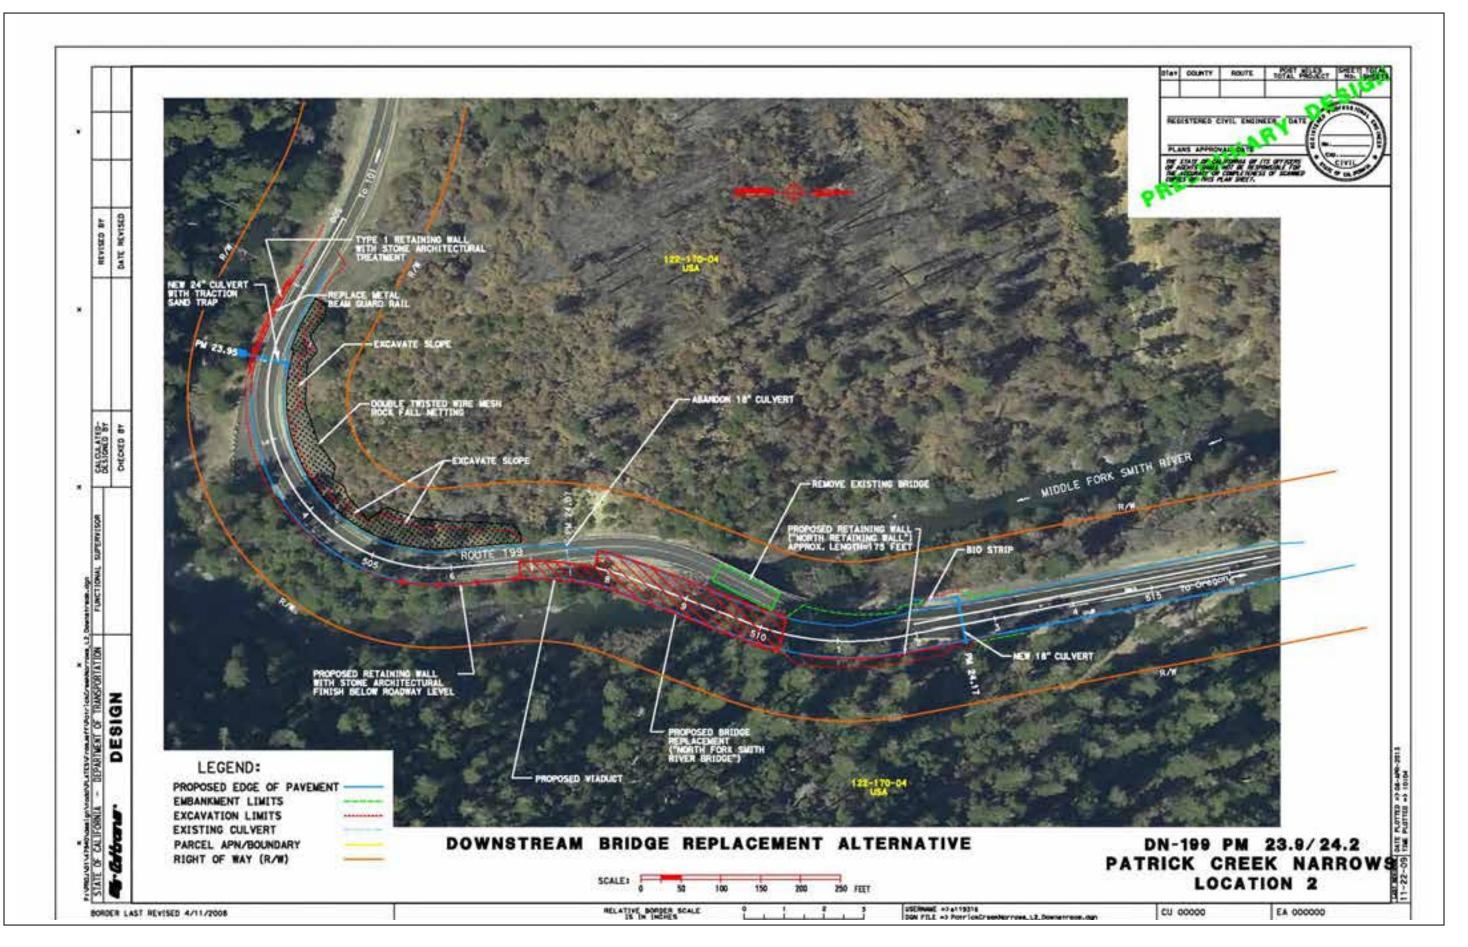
Patrick Creek Narrows Location 2: Downstream Bridge Replacement
